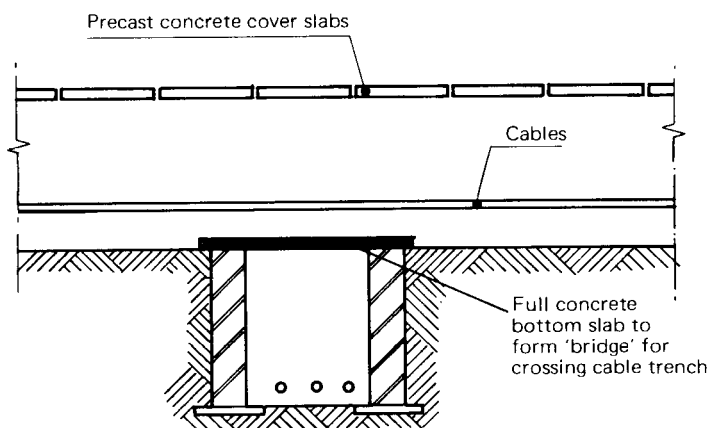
CROSS SECTIONS AND LAY-OUT OF CABLE TRENCHES
